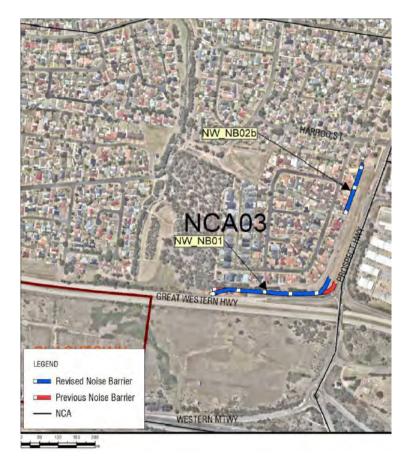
Alignment of original Detailed Design noise wall NW NB01 (red) and new proposed alignment (blue)
